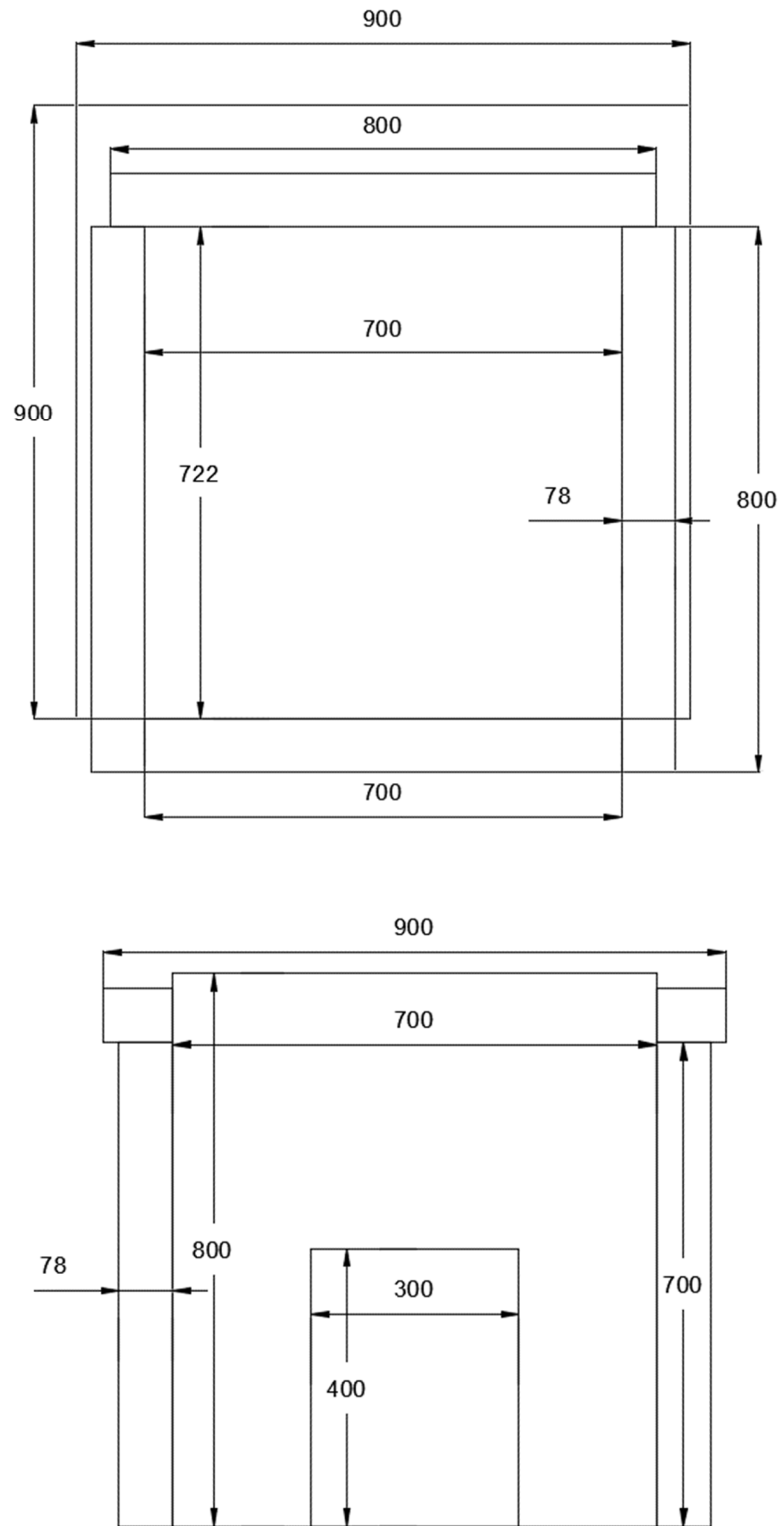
Section view (top) and elevation (bottom) of compartment. All dimensions in mm.
